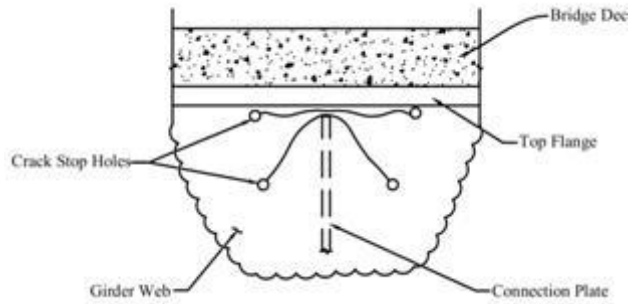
Crack-arrest holes at fatigue cracks (Roddis and Zhao 2001)
